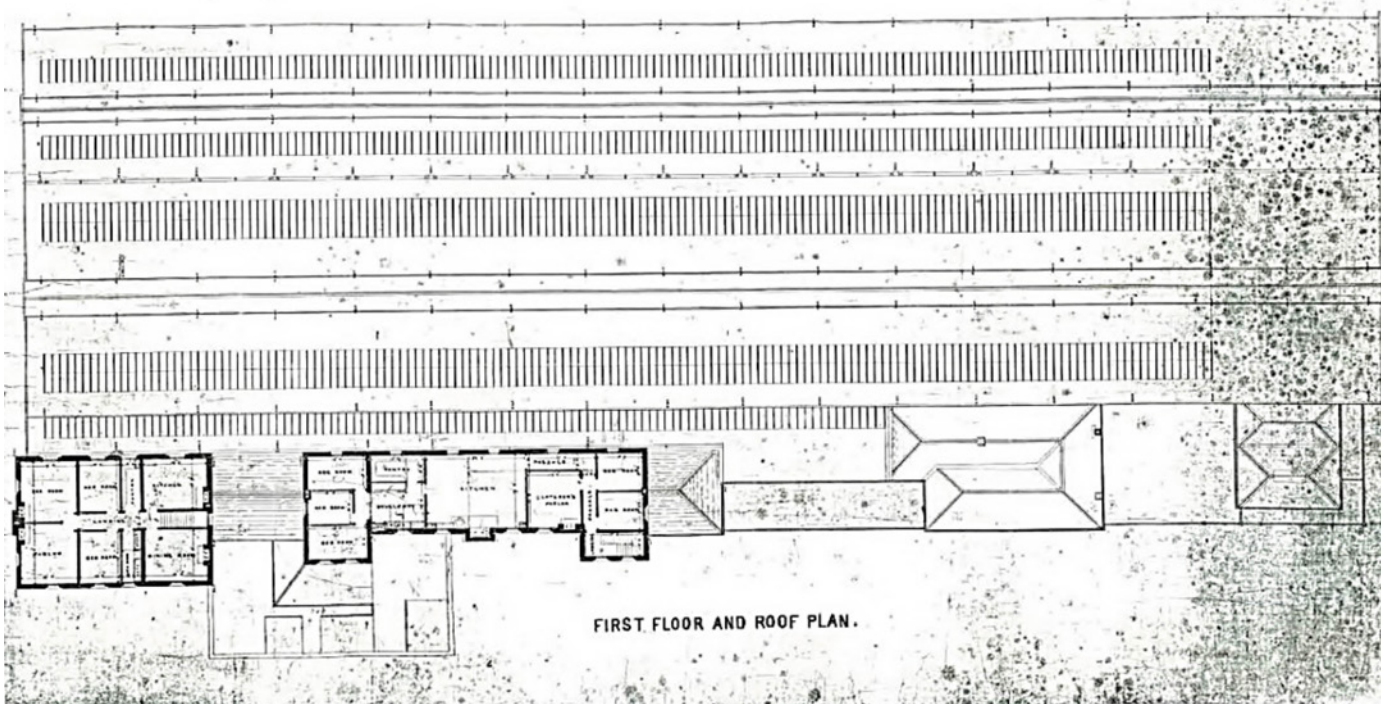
S. Bindley, Geelong Railway Station First Floor & Roof Plan, 1881. Source: GRS 3148, Geelong Heritage Centre collection.
